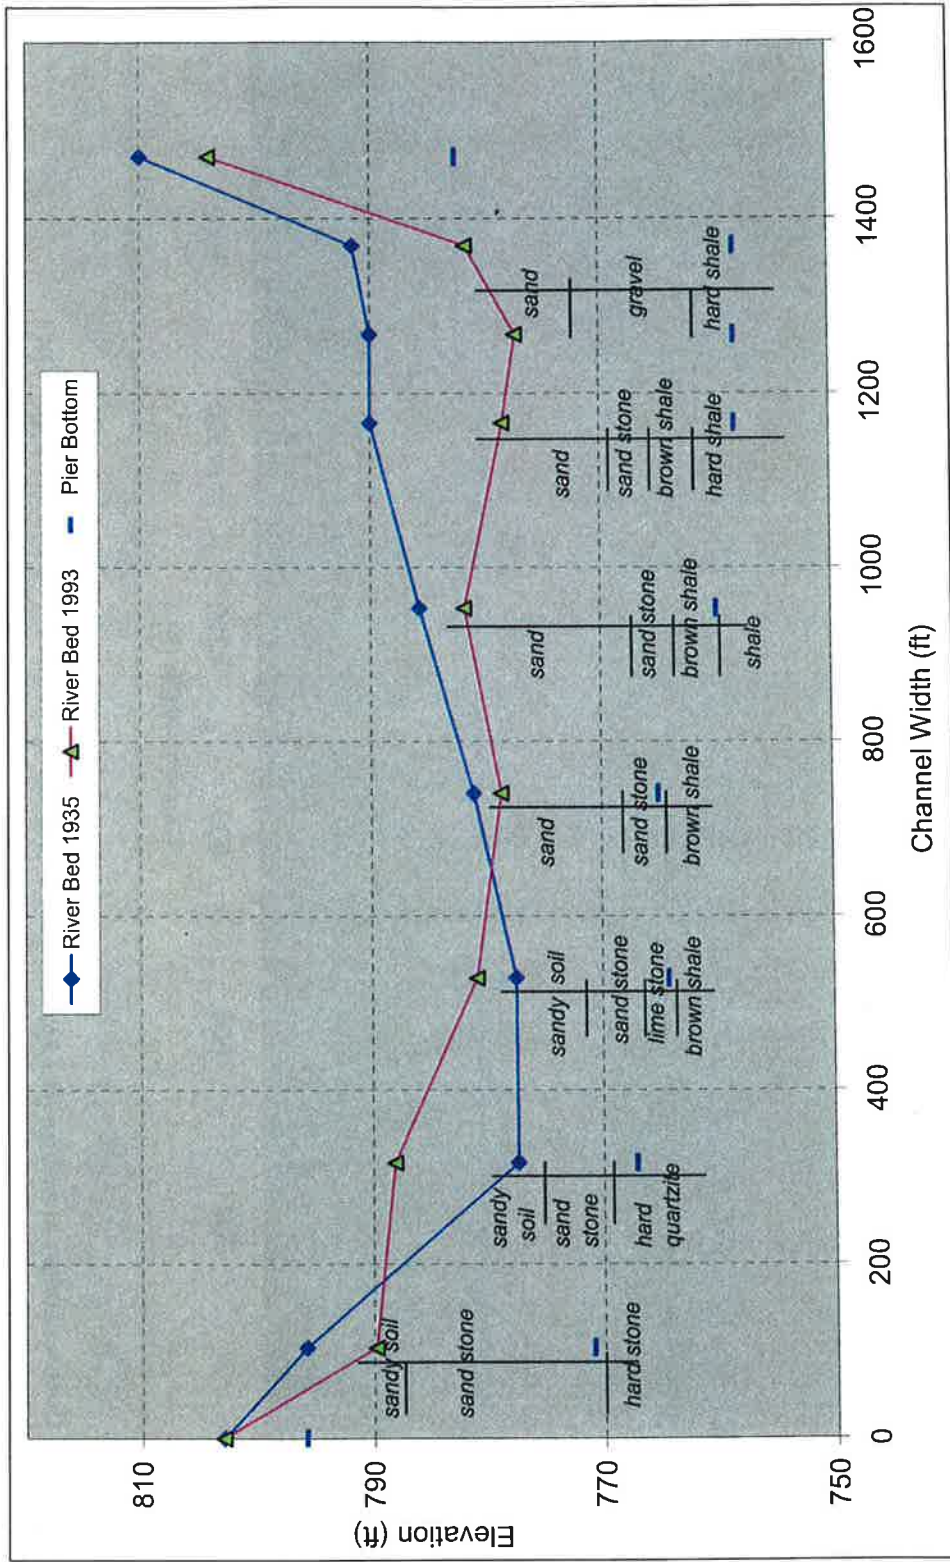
Cross-section at bridge (Bridge No. 04603 and RS 2) on SH 18, Arkansas River, OK
